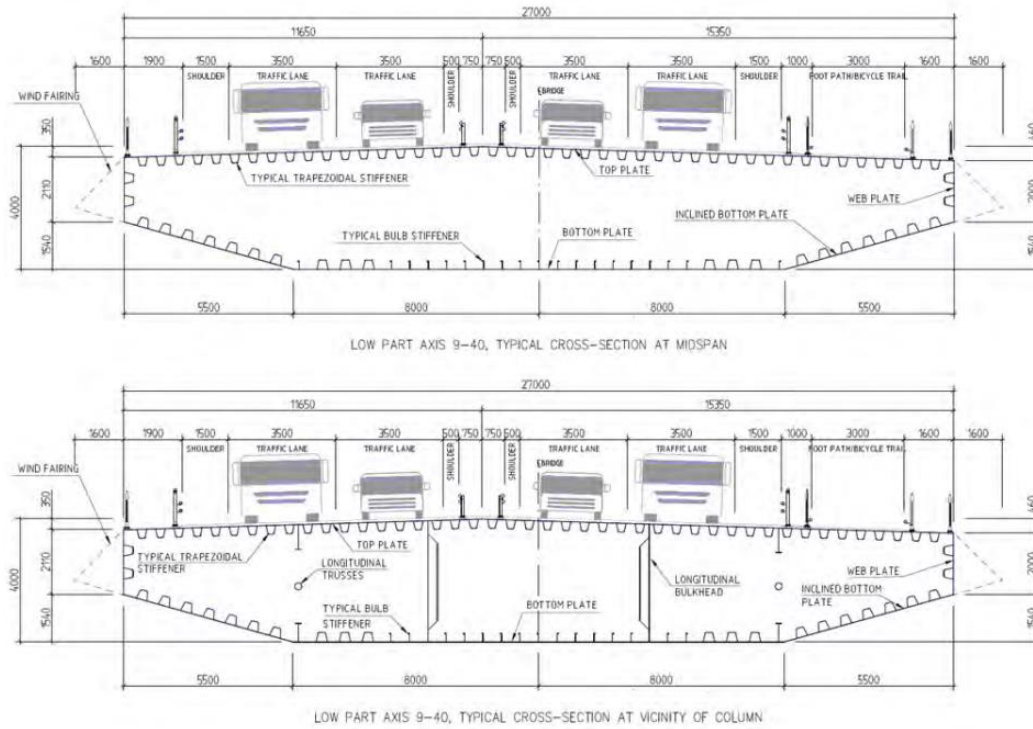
Geometric shape of steel bridge girder at midspan and in vicinity of column [5]
